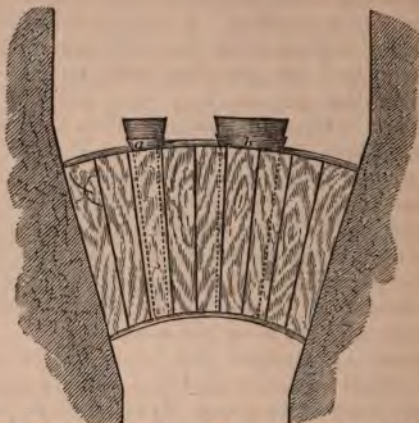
FRAME DAM, Plan. Scale $\frac{1}{4}$ in. = 1 ft.
